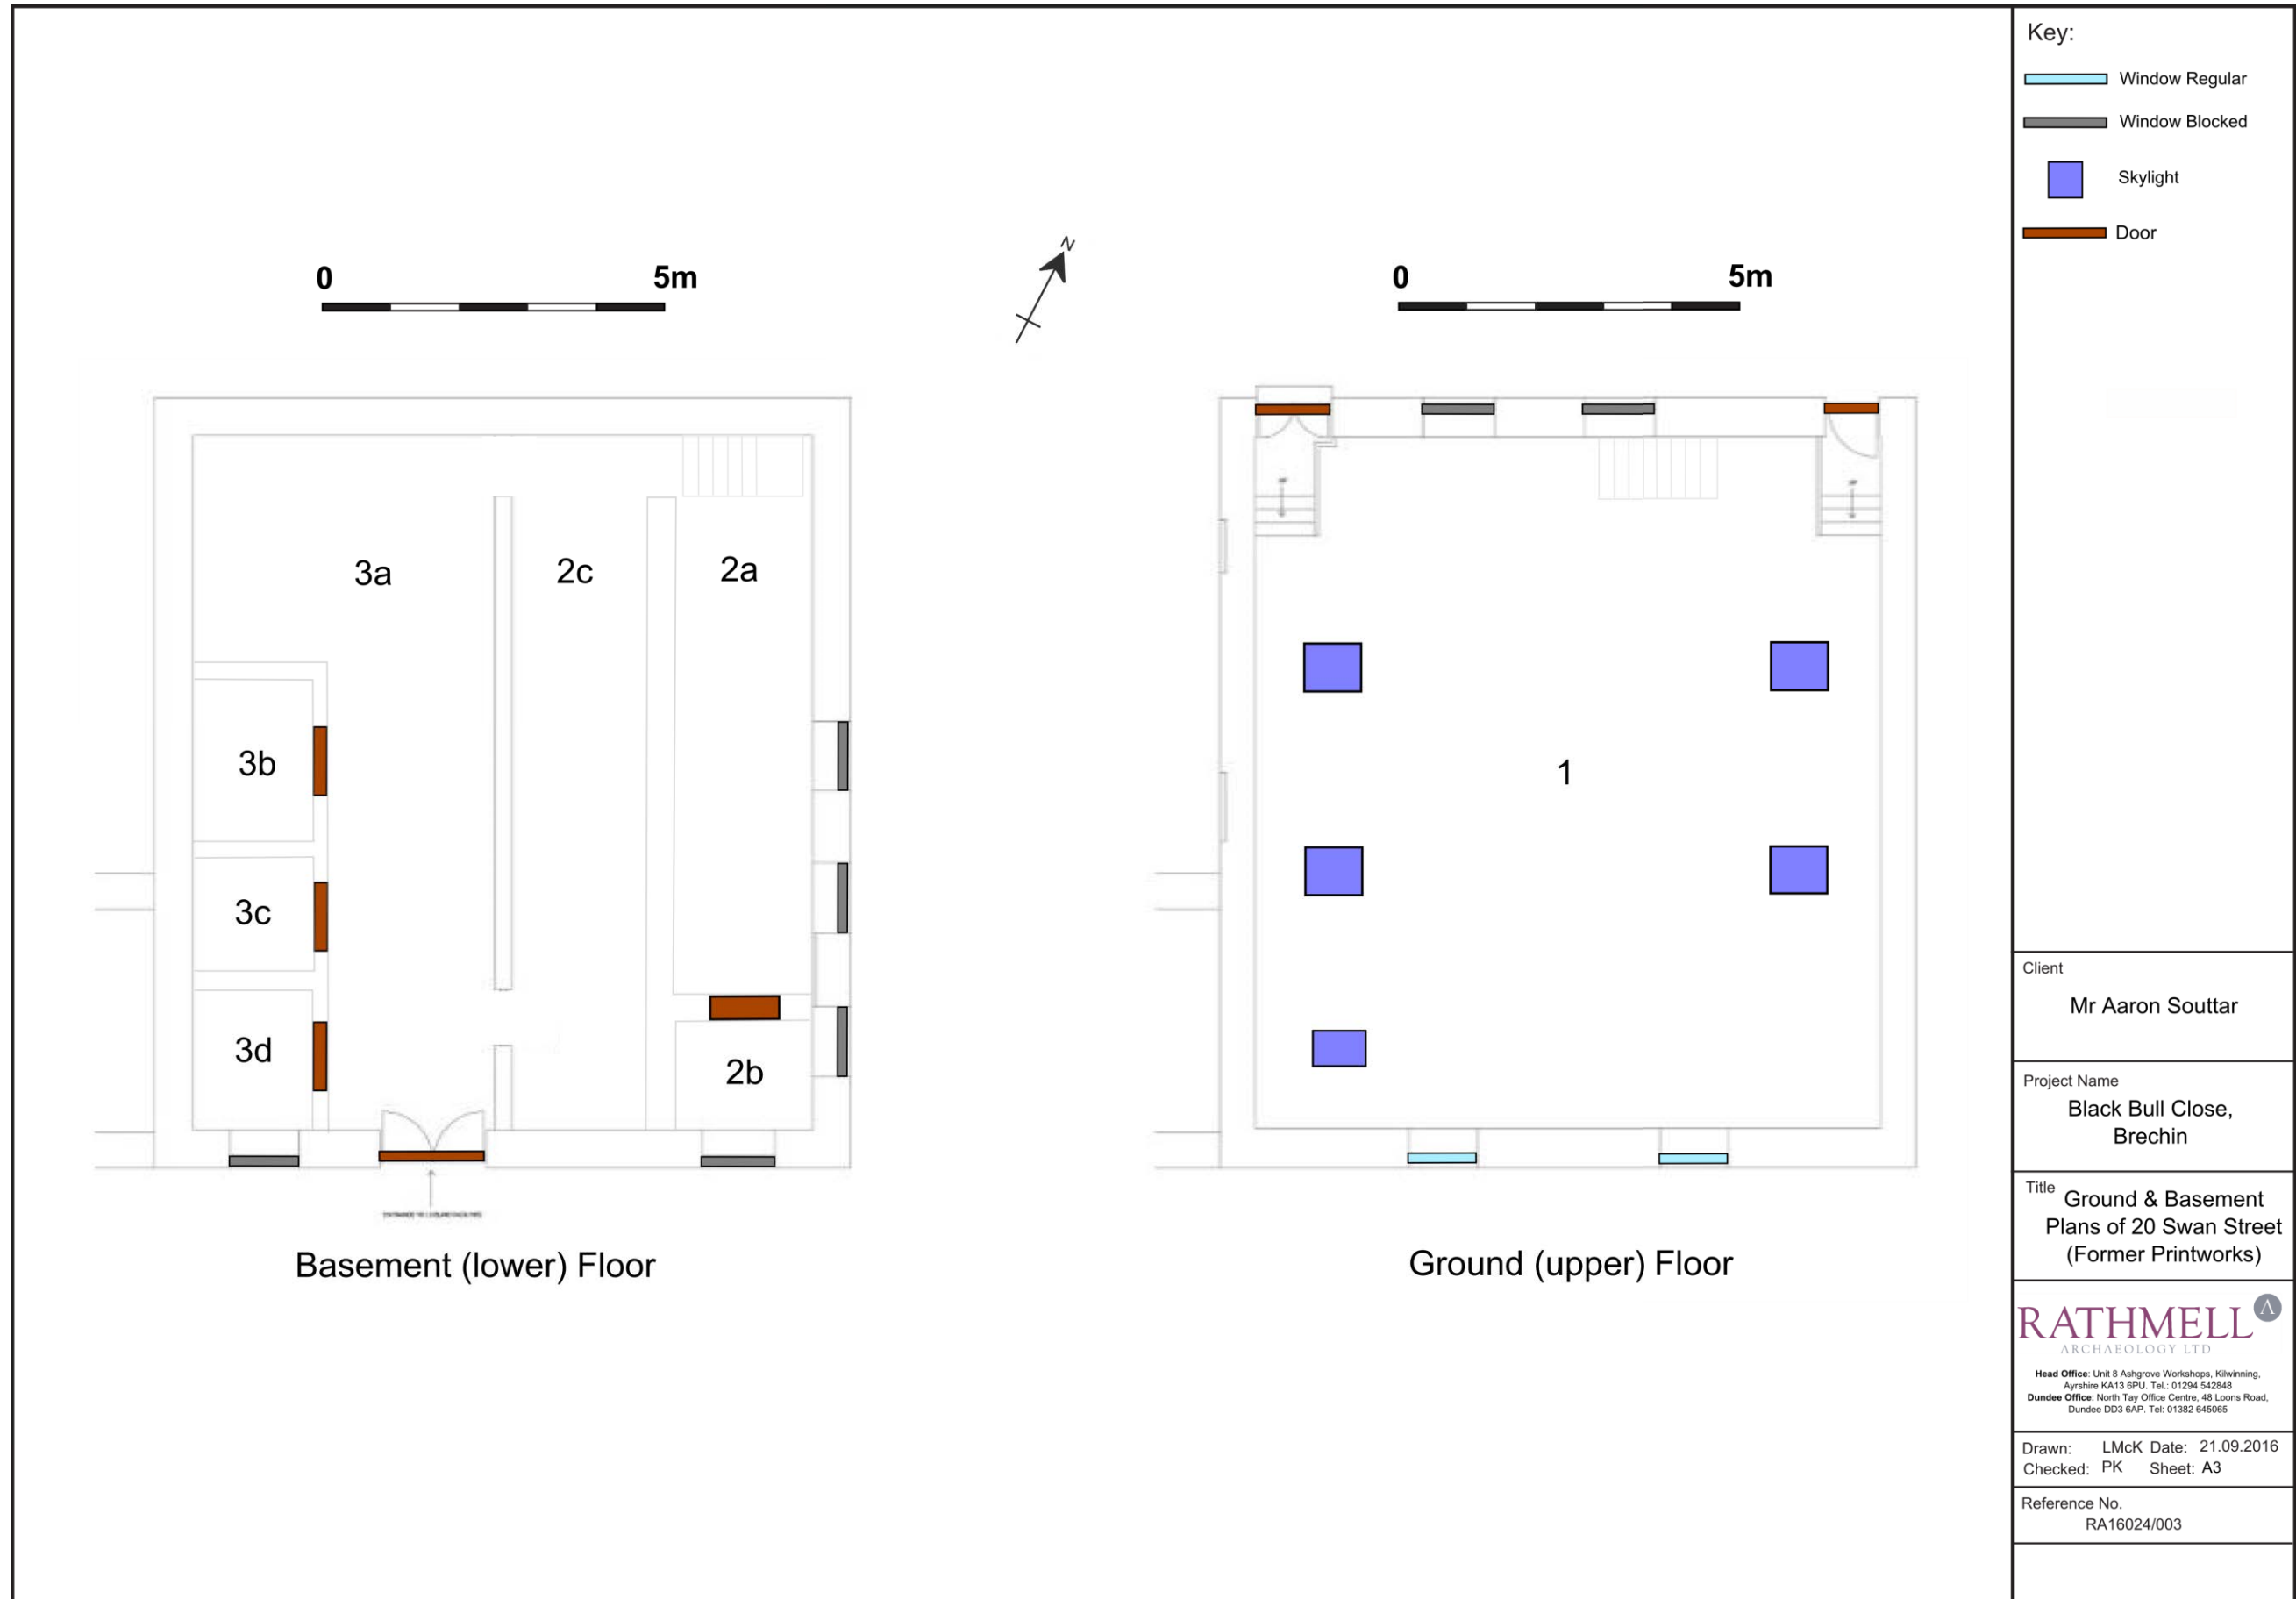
Ground and Basement floor plans of 20 Swan Street (Former Print works).
